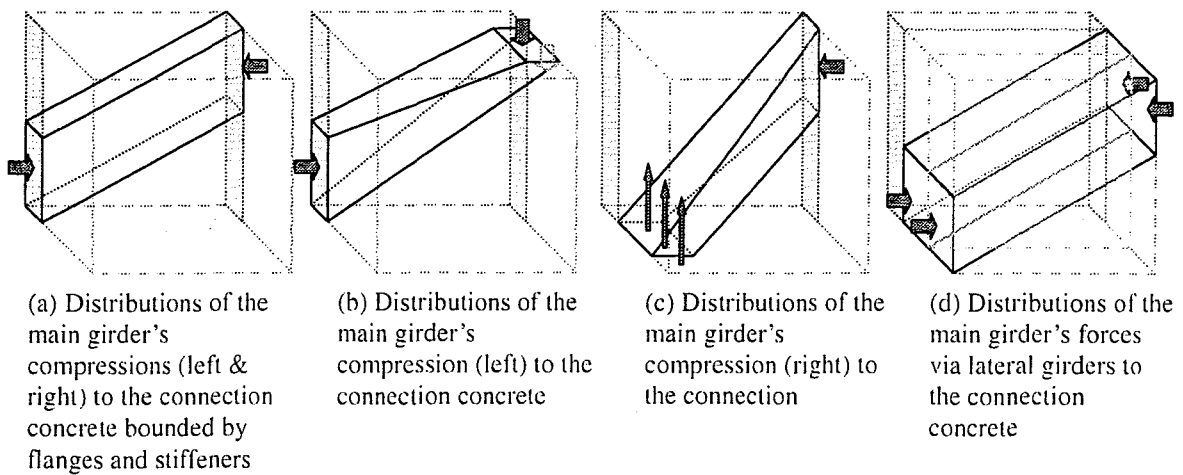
(b) Force transfer mechanisms inside the connection concrete of specimen C-3.
